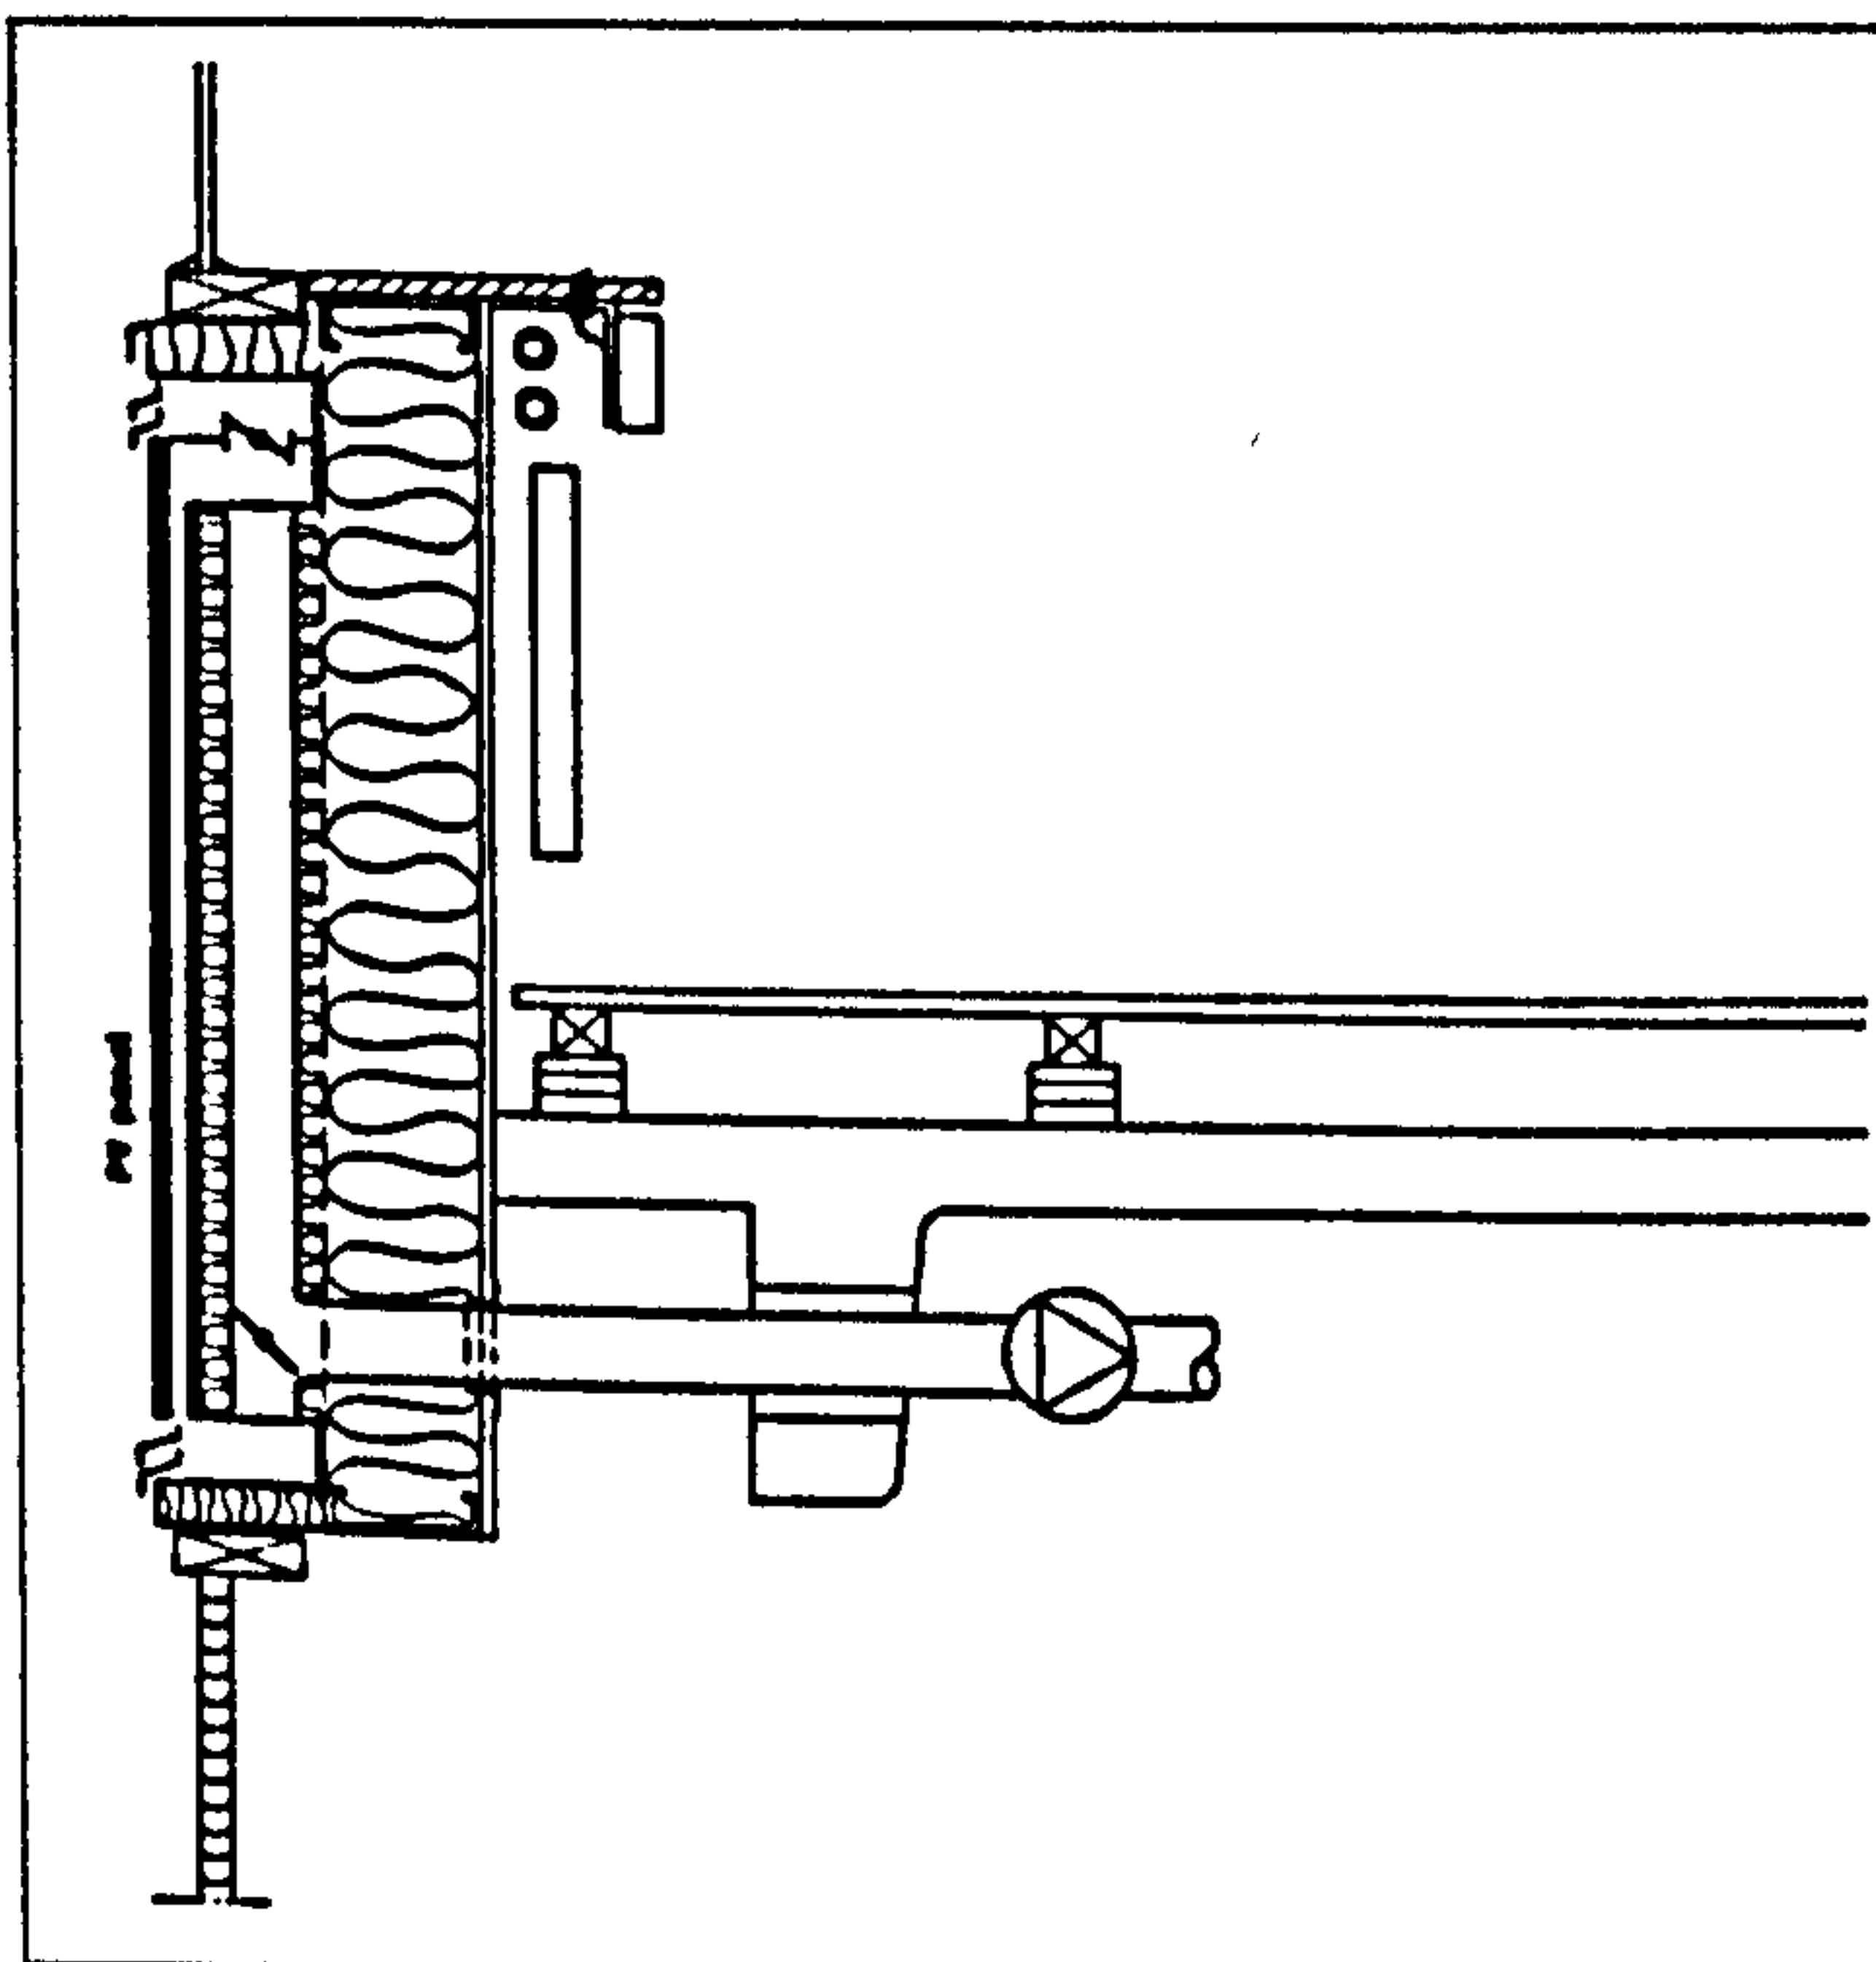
Section through south-east facing offices external wall. Design intentions
